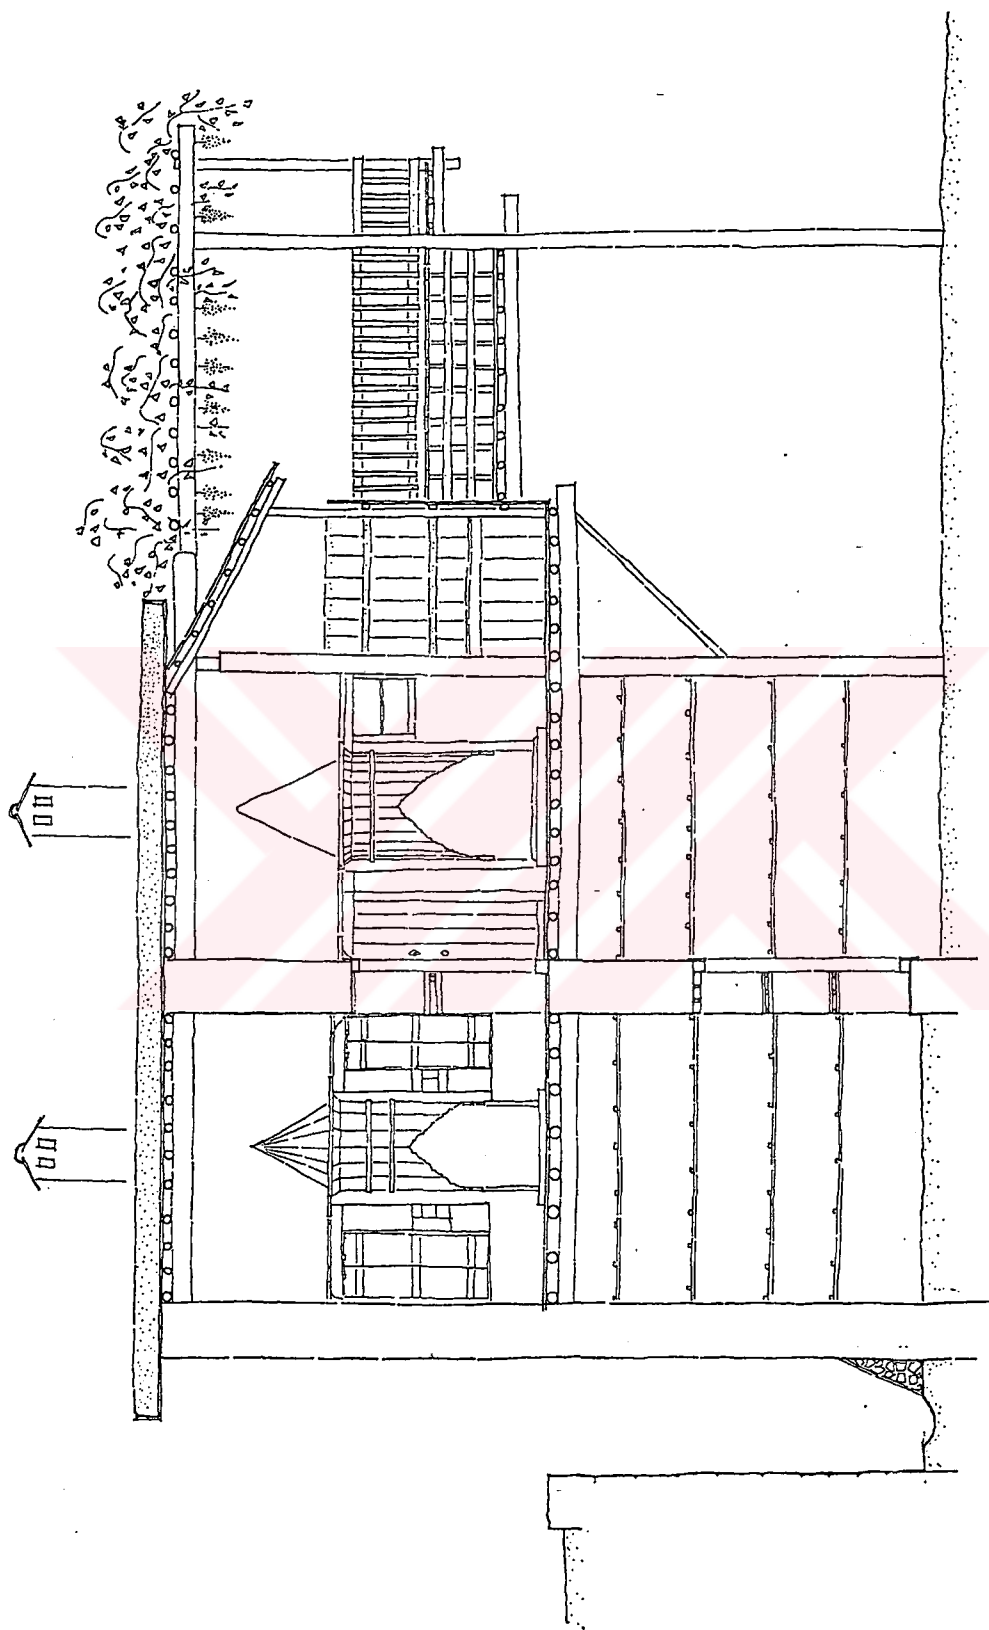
Schematic section of a traditional "yayla" house in south-north direction, showing different construction techniques and roof covers.
